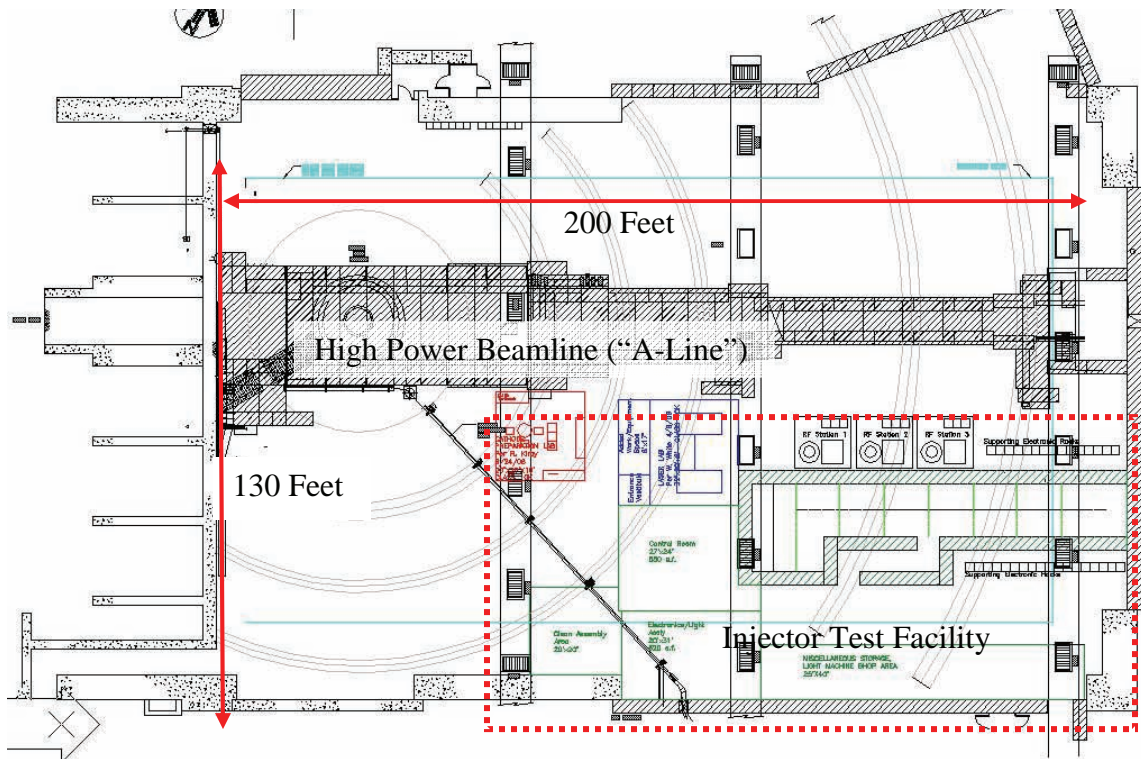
Possible siting of the Injector Test Facility within End Station A (building 61). Minor cleanup of existing stored objects, and installation of 480V service feeders are needed for this site. The ITF facilities in this case are all new construction.
